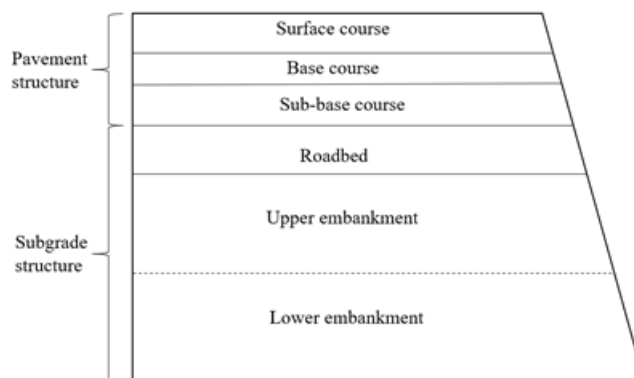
Typical structure of a flexible pavement structure and its subgrade
